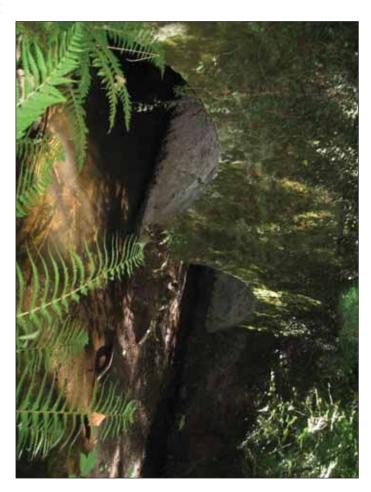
Western elevation of St Patricks mill race culvert emerging under the R639 road
